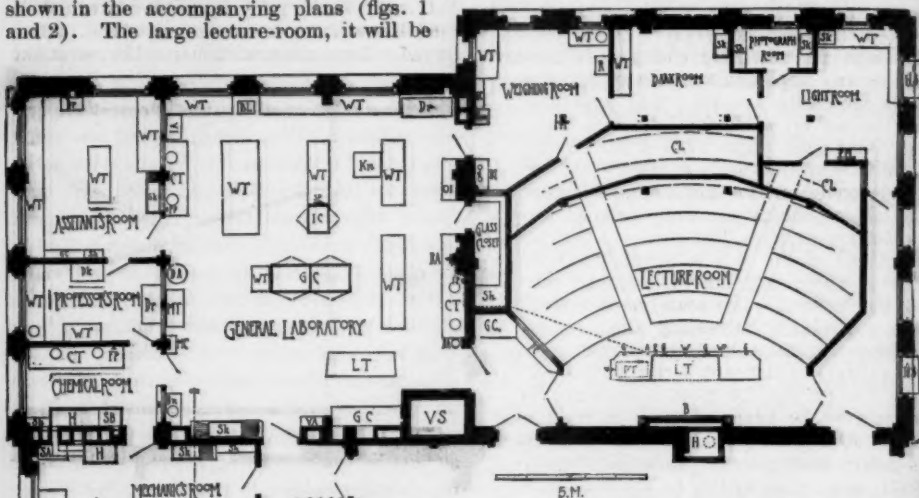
GENERAL PLAN OF LABORATORY AND LECTURE-ROOM.
